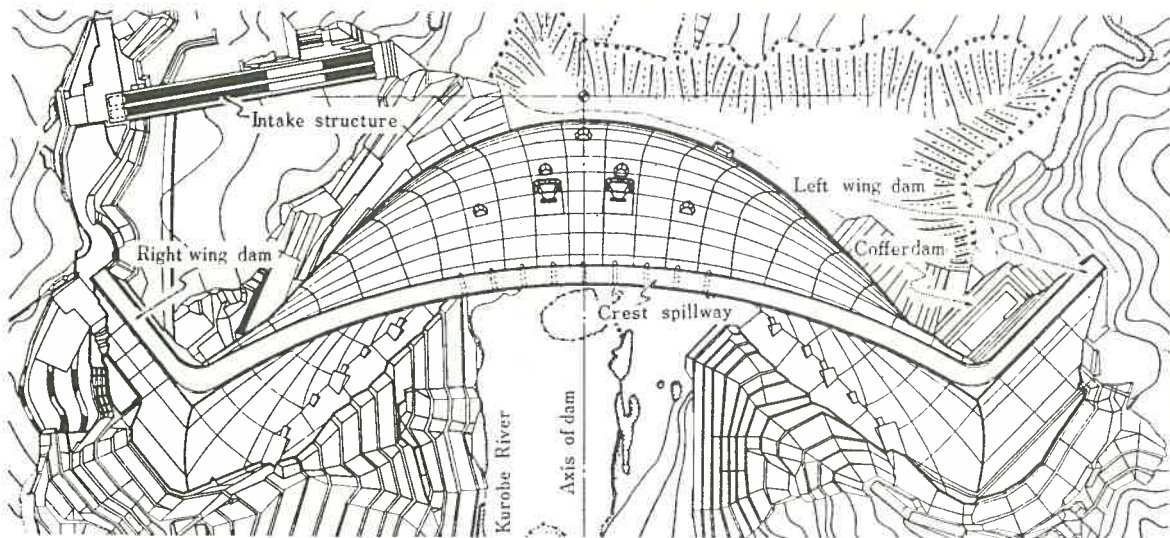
Kurobe Dam - General Plan Outlet Conduit
